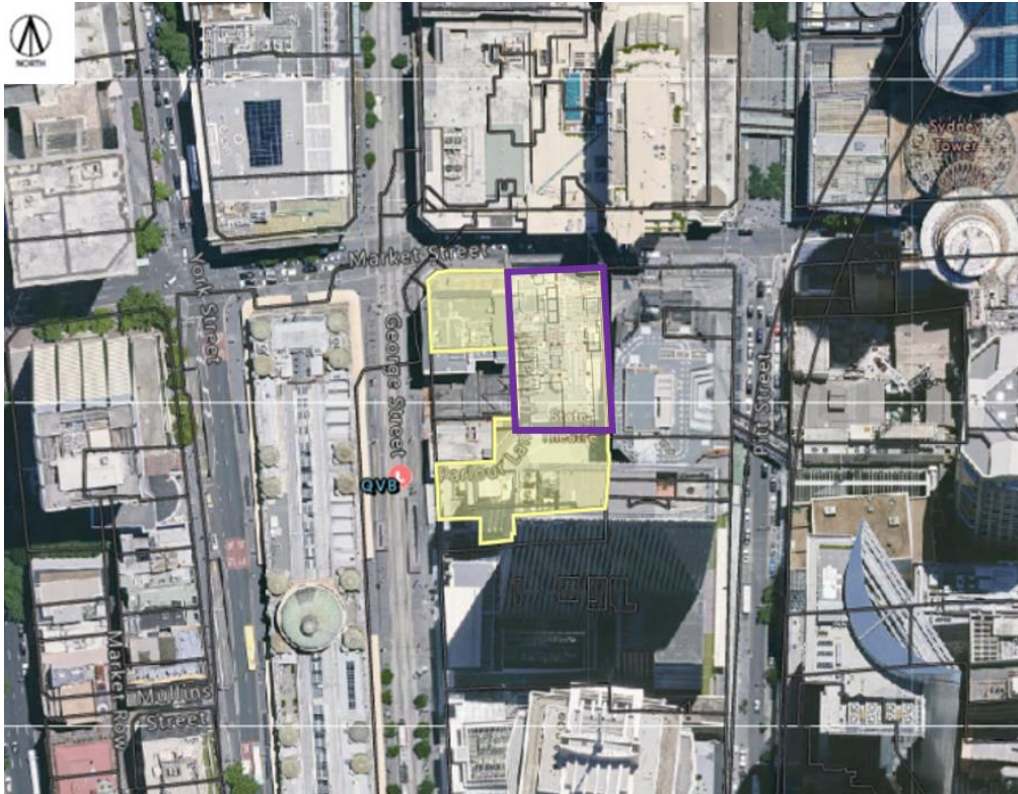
Aerial view of site and surrounds (site boundaries in blue | location of works in blue)
